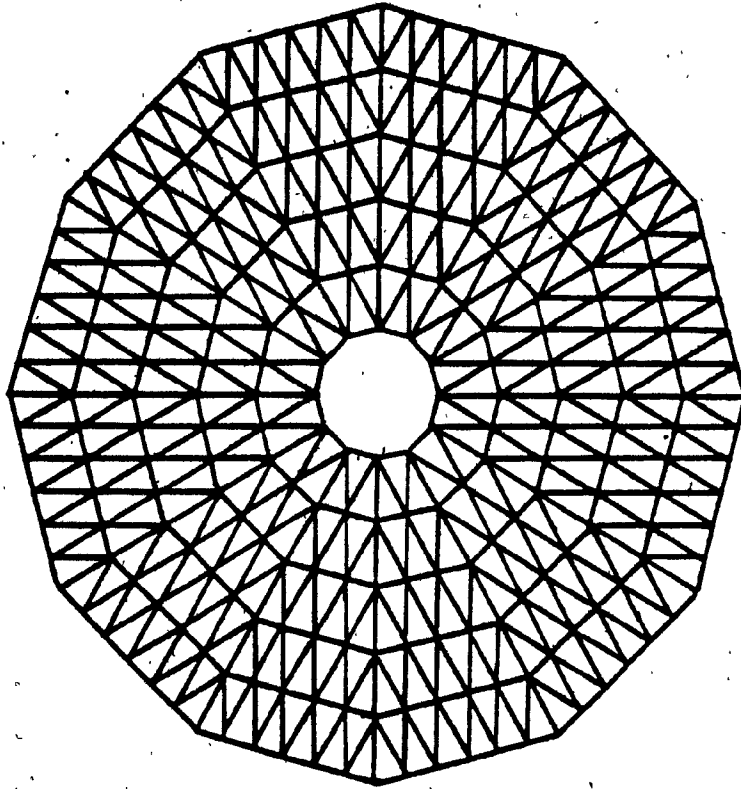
PLAN VIEW OF A REGULAR DODECAGONAL RING TRUSS WITH SIX EQUALLY SPACED RINGS: THE BRACING TRUSSES HAVE NOT BEEN SHOWN.
